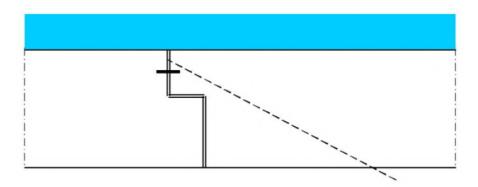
Drilling and injection method to seal leaks at expansion joints (Leeuw, 2013)
